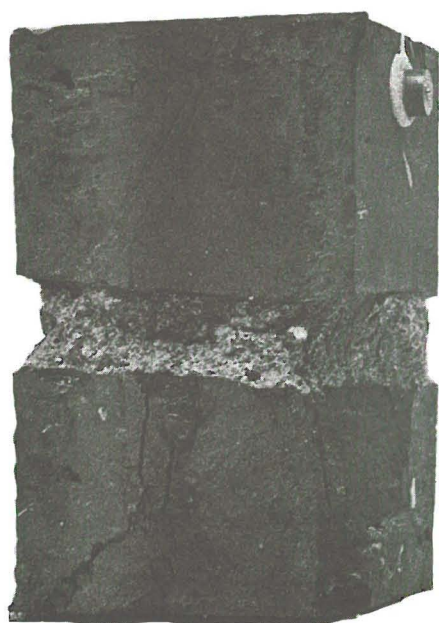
"San Giovanni"—Sample of masonry after failure.
